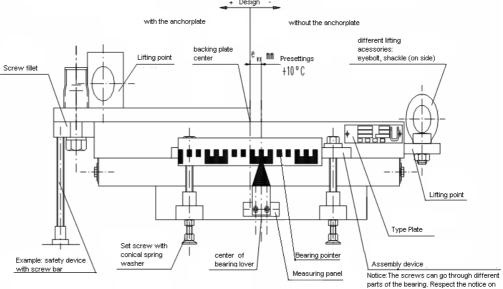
Side view of slide bearing, bearing position pointer according to RiZ Lag 1
